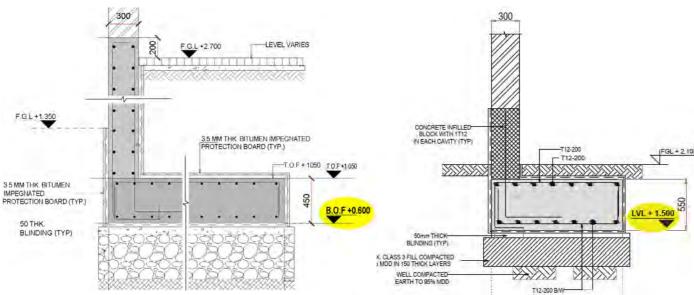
Typical privacy wall footing detail highlighting bottom footing level at Inner canal.
